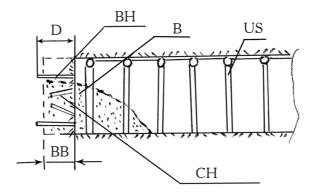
A working platform and bench in an underground mine after drilling and blasting
